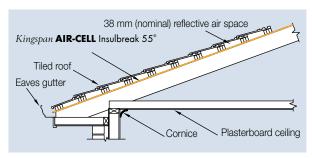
Side elevation of *Kingspan* AIR-CELL Insulbreak® 55 in a tiled roof with an attic space and a flat ceiling
